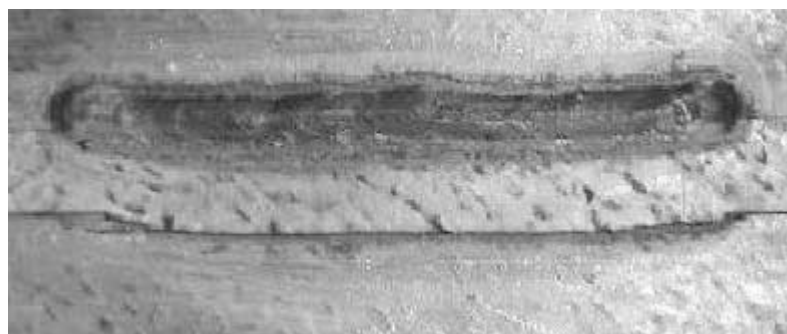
HAZ failure of a single-lap transverse fillet welded connection in 1.5-mm sheet steel
